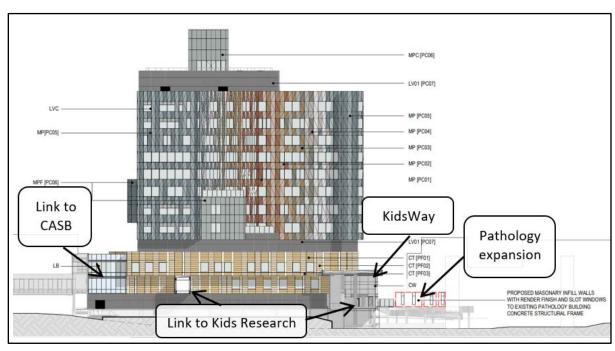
| PSB south-east elevation and materiality (Source: Applicant's RtS)
